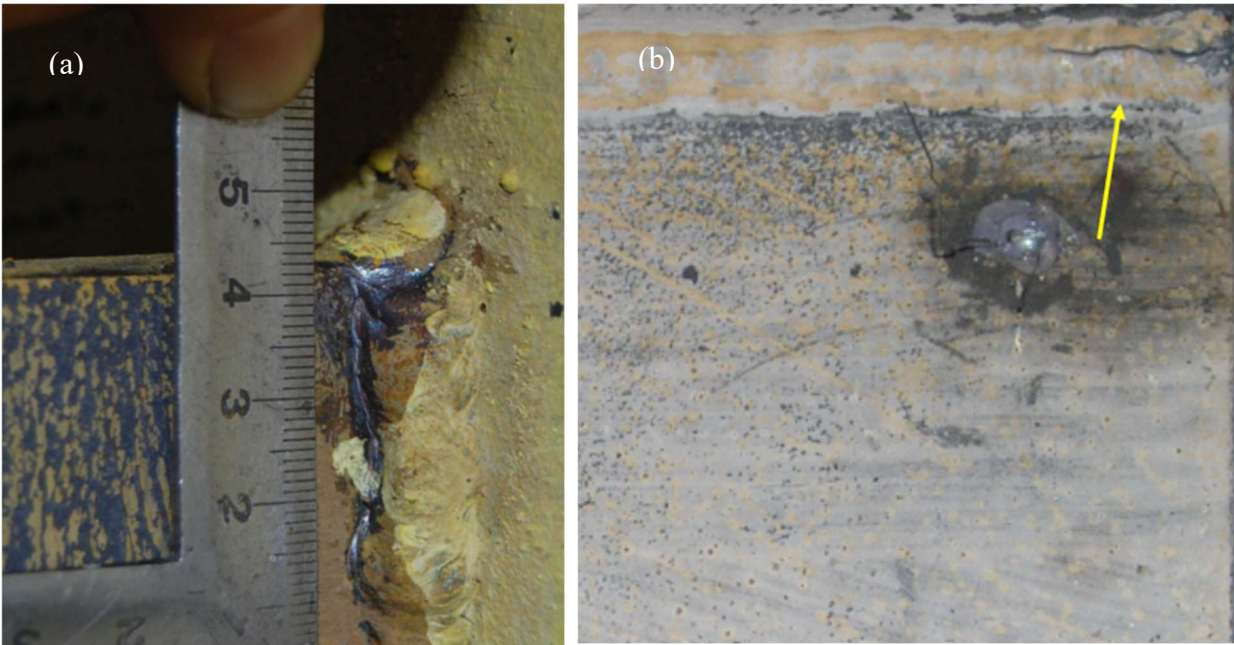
Examples of DS2: initiation of gusset plate fracture, for (a) fillet welds (Sen, 2014) and (b) complete joint penetration welds (Herman, 2007).
